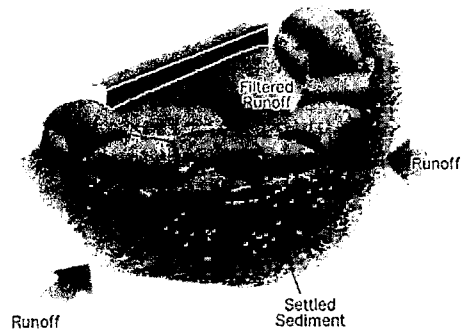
Illustration of a storm drain inlet with rock-filled bags filtering stormwater.
